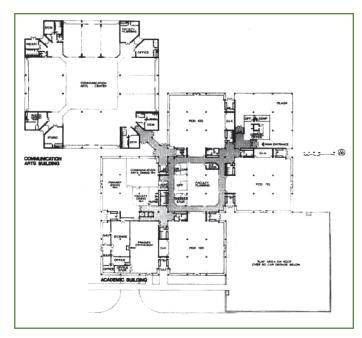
From Tanner and Lackney, 2006, The floor plan of the "open plan" Disney School, designed by Perkins & Will, Architects
